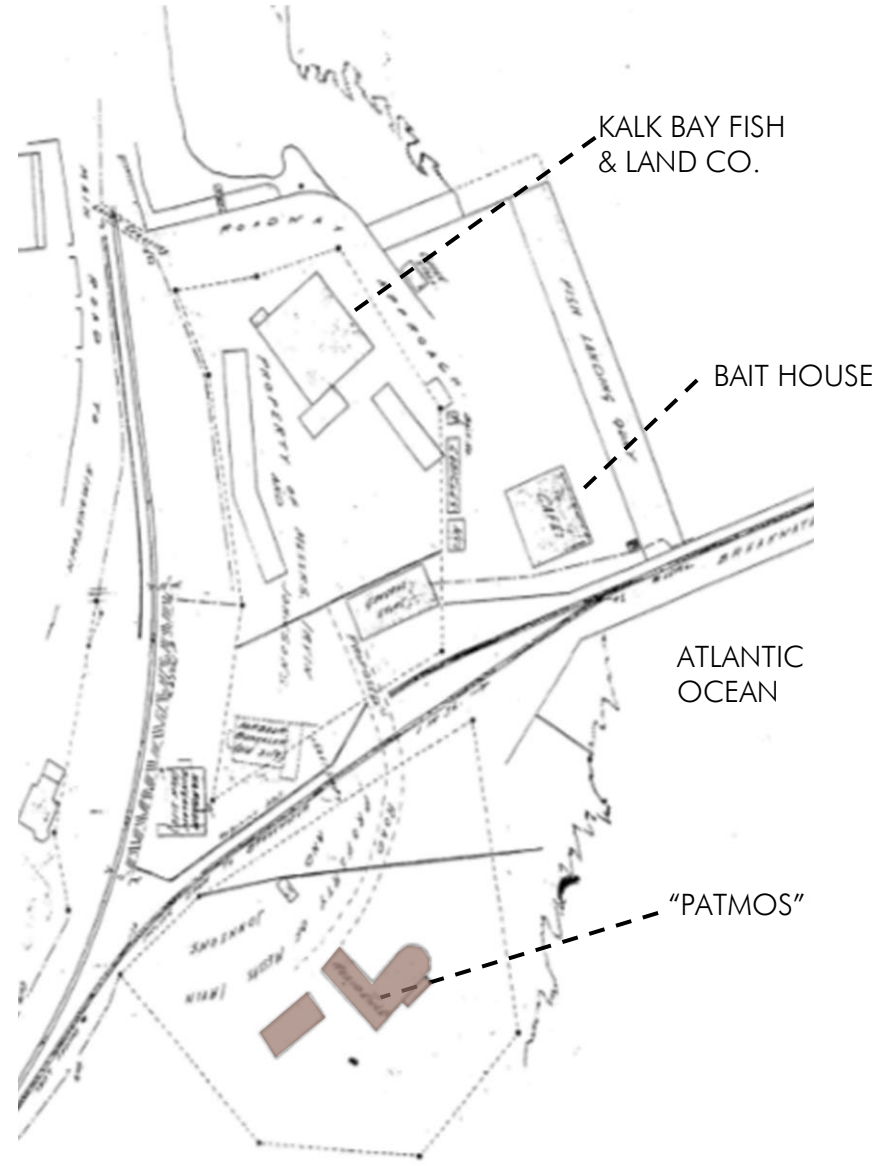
Plan of new harbour buildings (Gasson, 2002: online).
